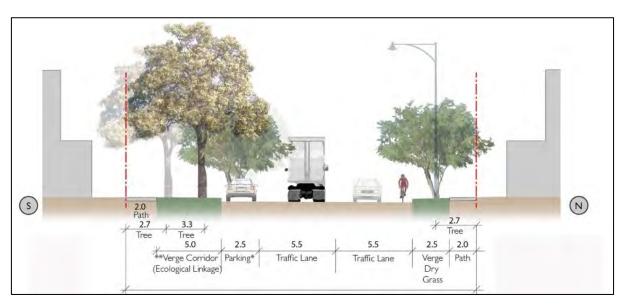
Proposed Road Reservation Width and Cross-Section for the LDR
